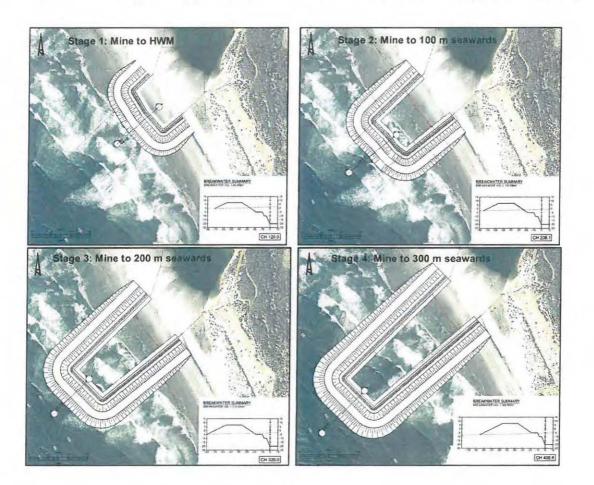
Plan view of berm layouts for mining at Site 68/69
